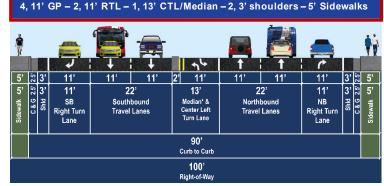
Short-Term Recommended Cross Section: Forest Meadows Street to Route 66
